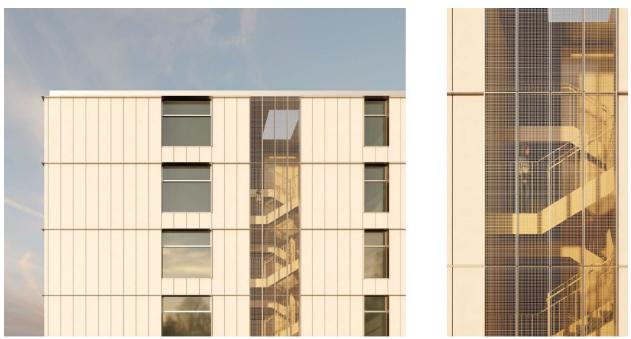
Building 3C Detail Looking North (Building 2 and 4 Similar)
